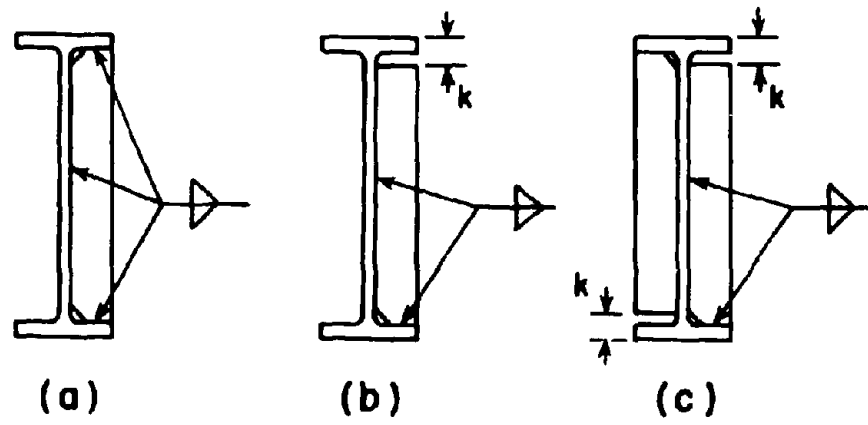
Three Possible Details for Connection of Stiffeners to Shear Links.
